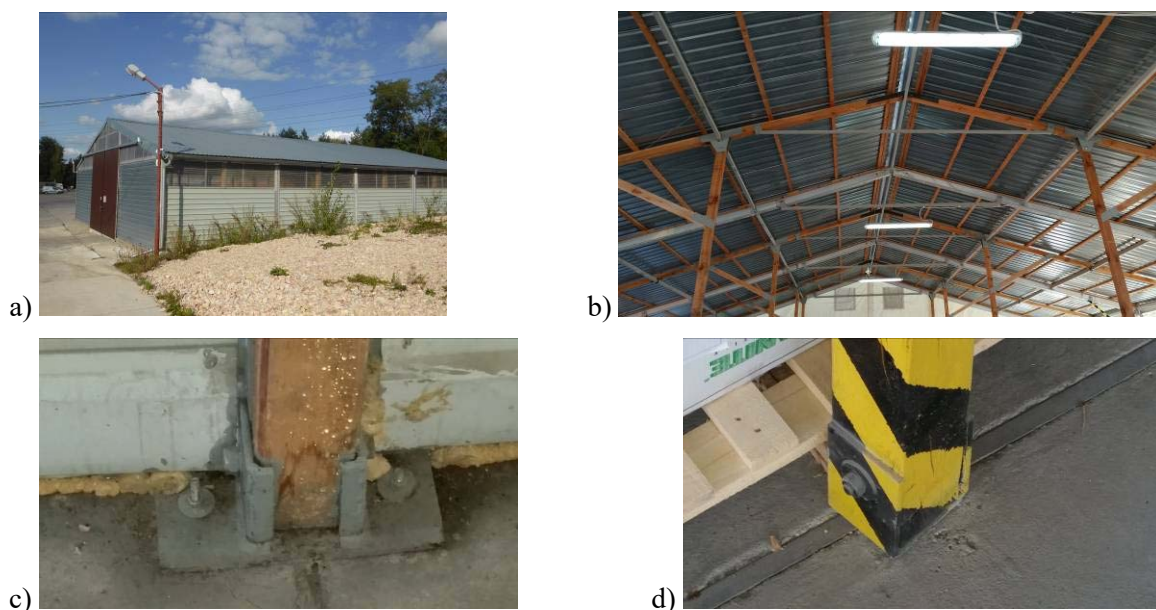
Presented tent hall a) general view, b) inside of the hall with additional wooden structure, c) post fixed to the floor, d) post fixture
